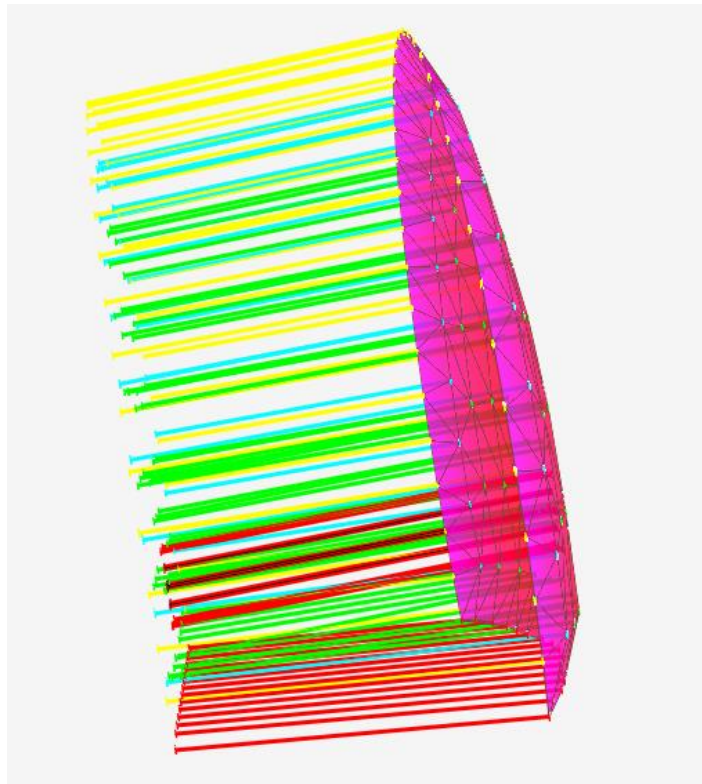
D-shaped tunnel face - iSURE - D&B design for poor blastability T10,5 - 134 detonators
